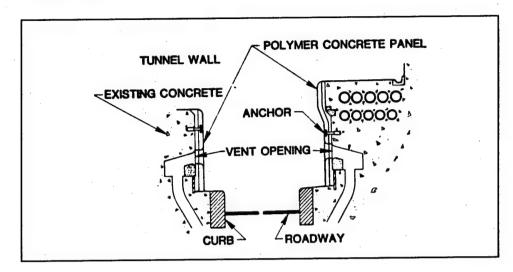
Cross section of plan for rehabilitation of Sumner Tunnel, Boston (from Barnaby and Dikeou 1984)
